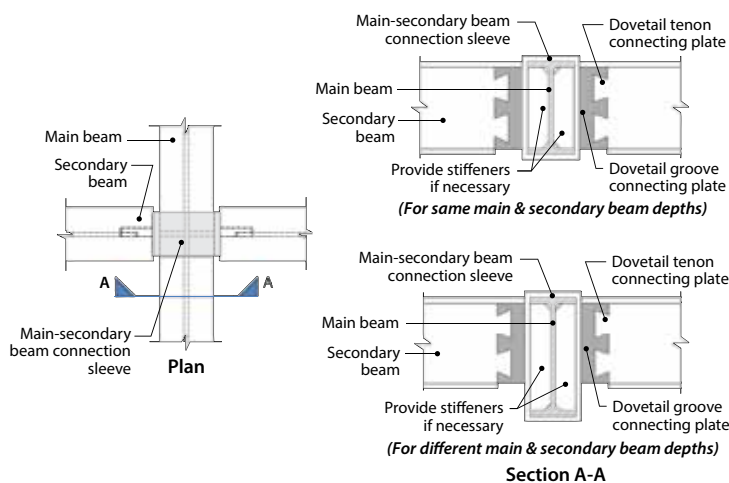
Connection between main beam and secondary beams using dovetail mortise connecting plate.
